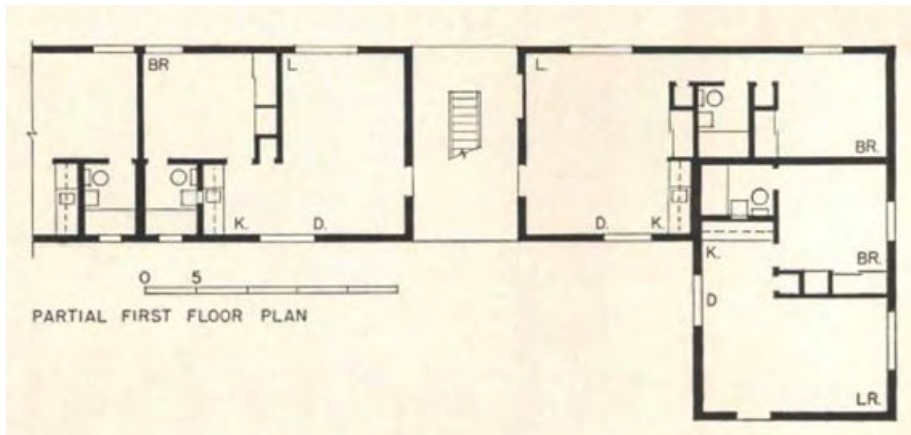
(top): Typical floor plan, L- or U-building, Northwood I. "Campus Housing in New and Varied Patterns, *Architectural Record* 120 (Aug. 1956), p. 193.
